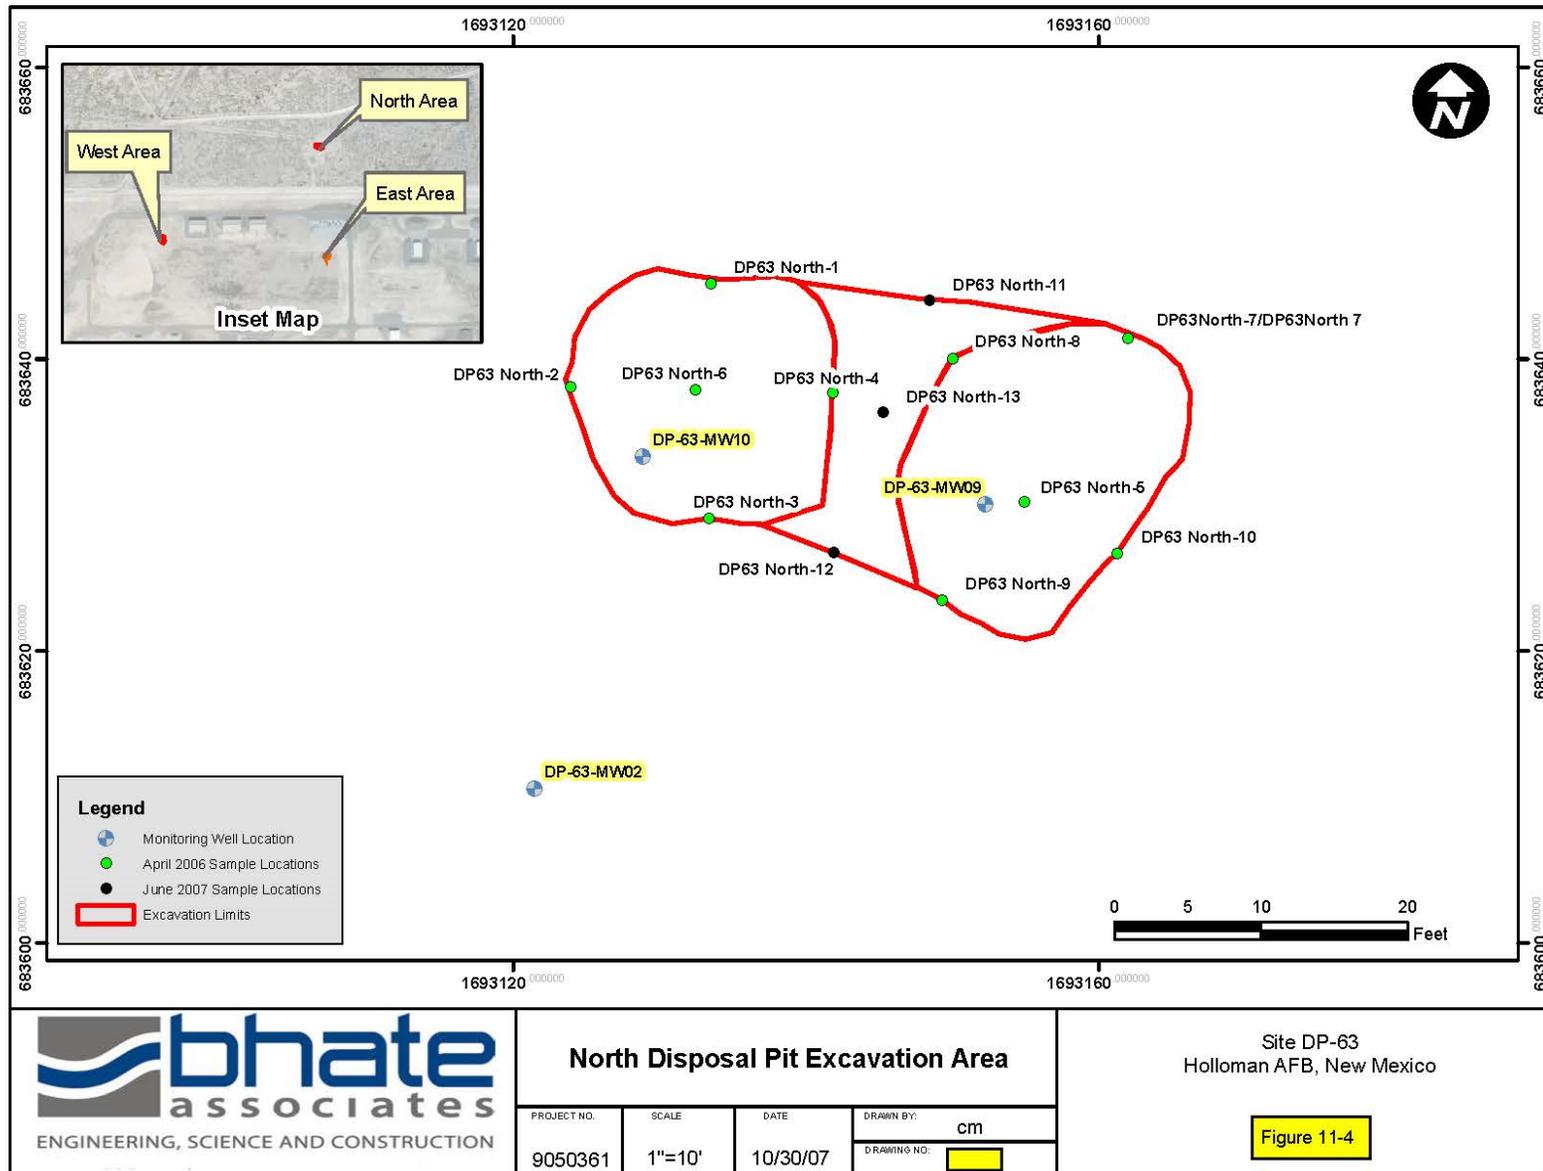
AOC-3 - DP-63 North Disposal Pit Excavation Area
